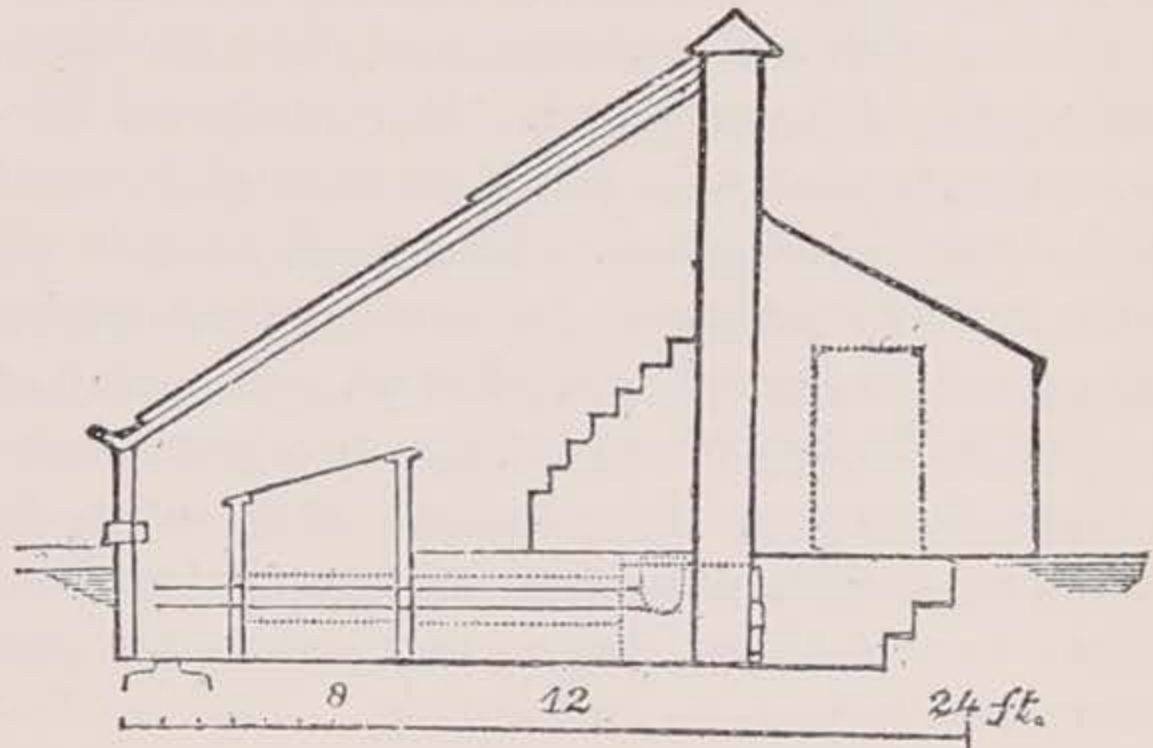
Plan of early form of greenhouse, 1836 (Hovey's Magazine).
